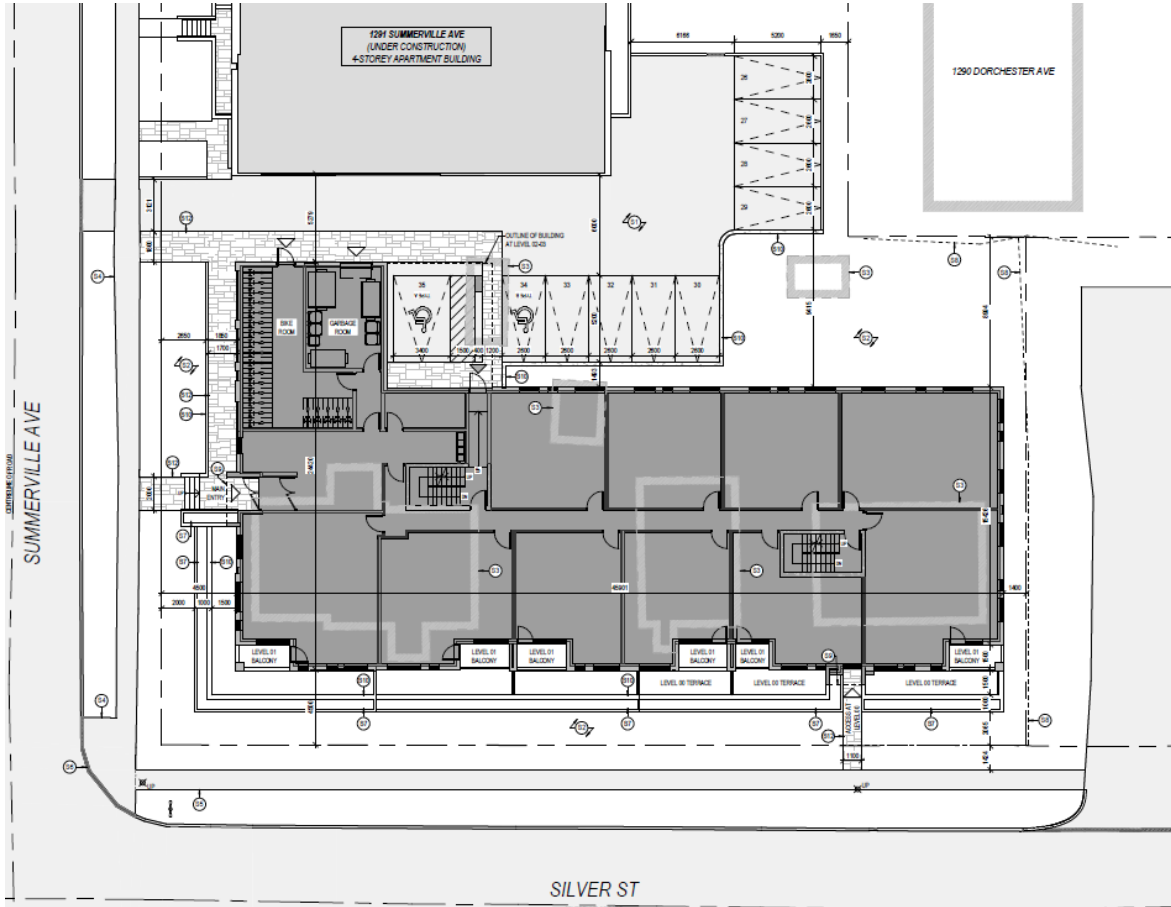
Proposed Site Plan. Building design by Project1 Studio
